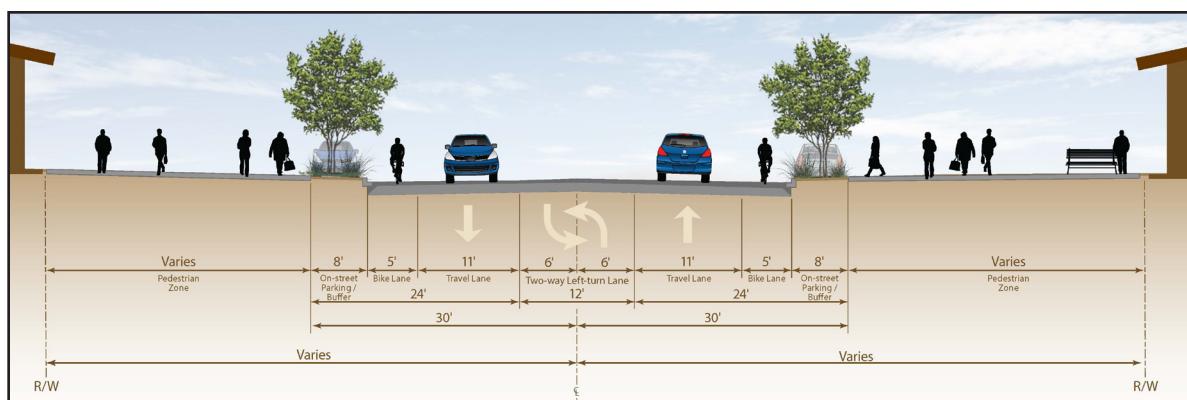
Modified Urban Minor Arterial - Van Buren Street
